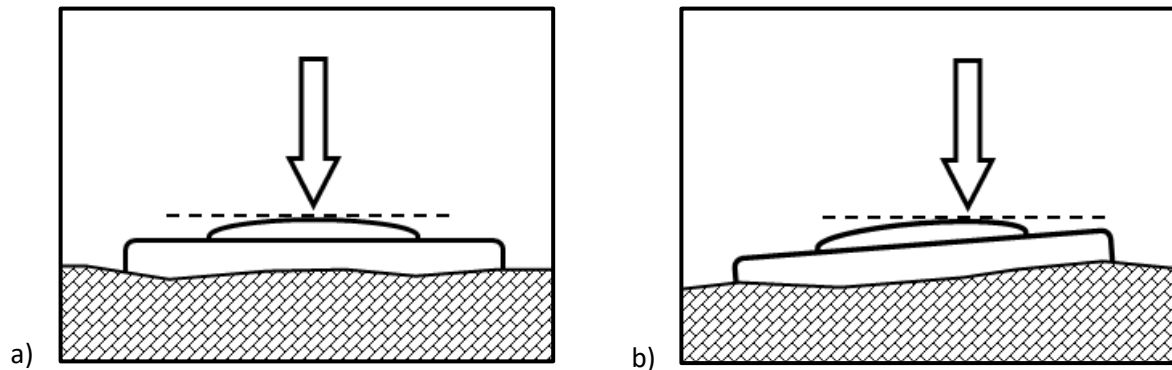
Benchmark caps mounted horizontally. The arrows show where the rod should be positioned when reading elevations.
